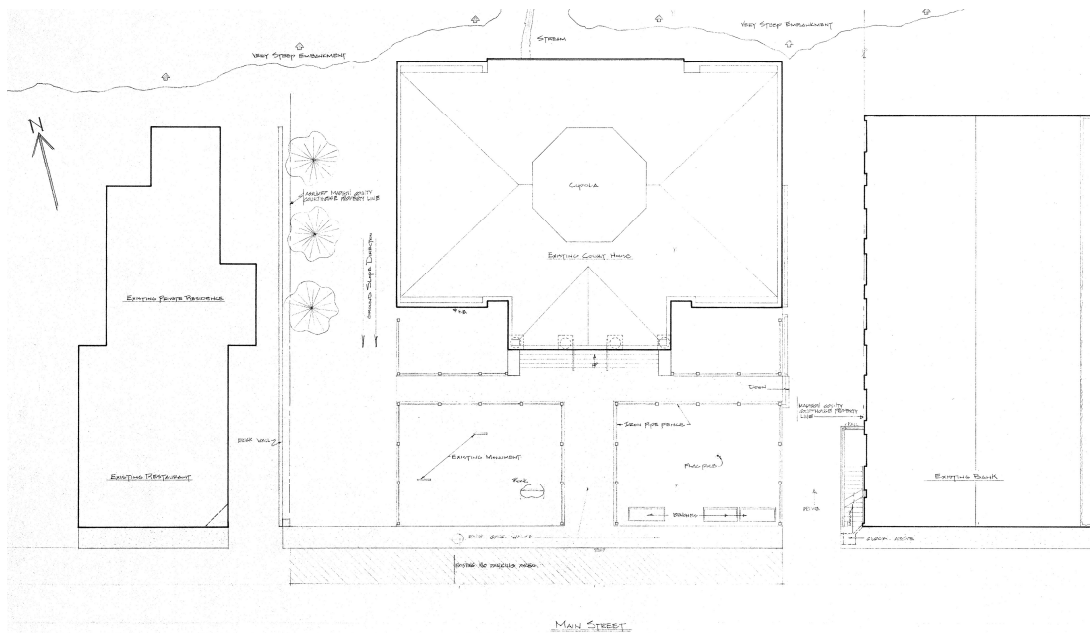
Site Plan (obtained from Renovations by Woodard and Roberts Architects)
